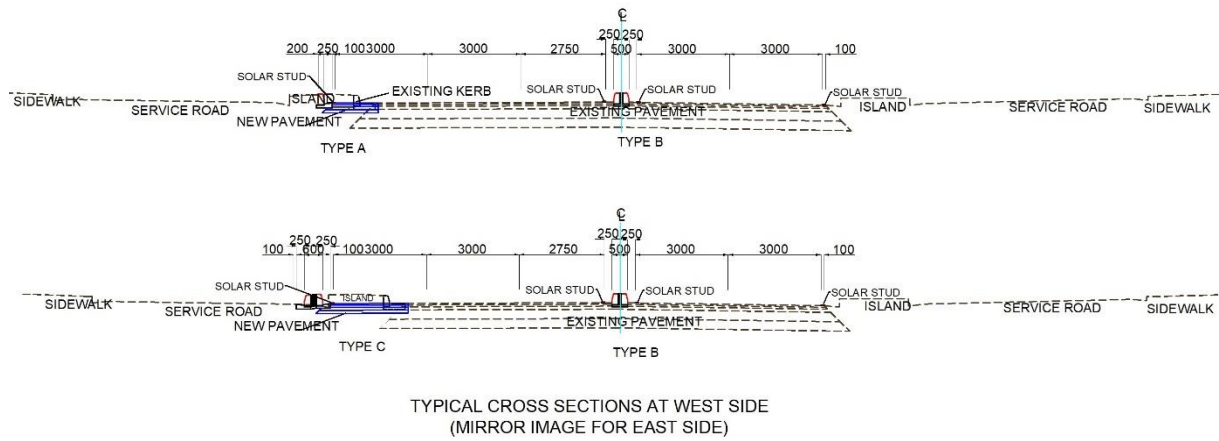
Naya Baneshwor Intersection Improvement Plan (1)
